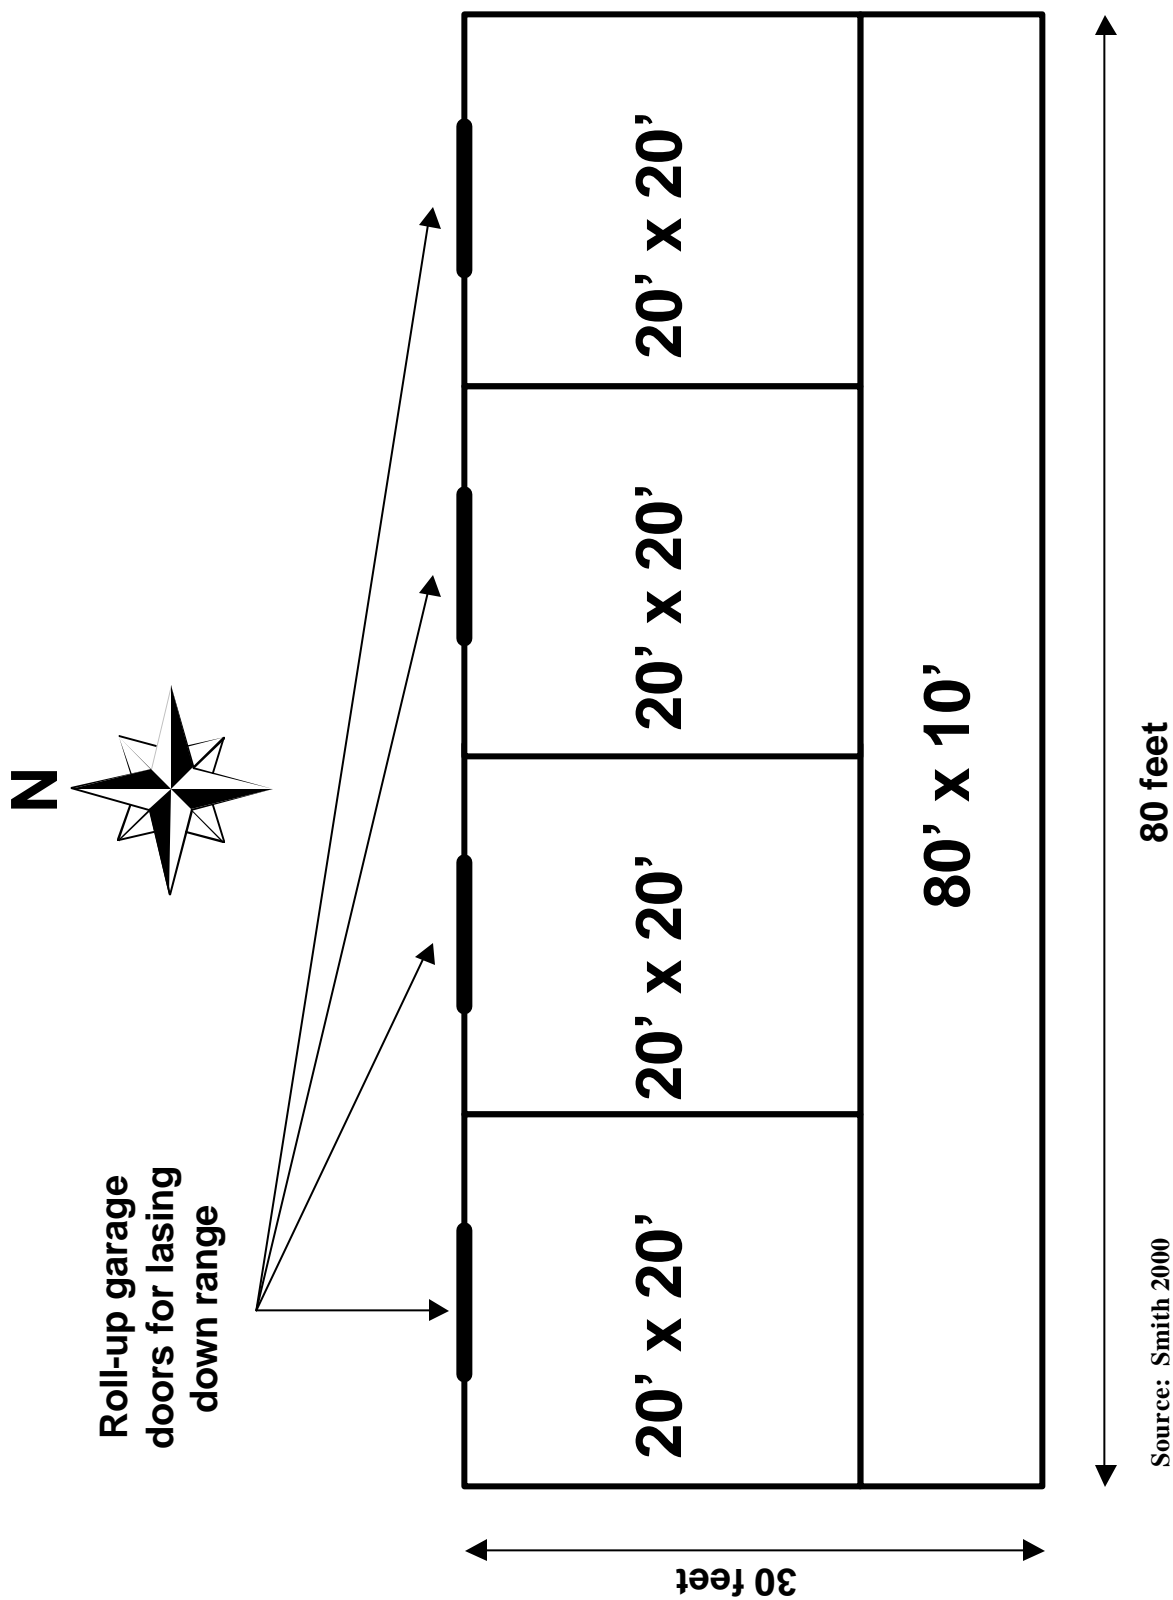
Proposed Indoor LADAR Test Range (Alternative 4), Site C-1
